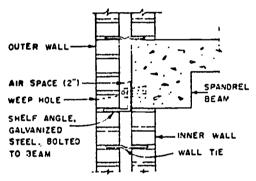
Typical Arrangement of Cavity Wall at a Spandtel Beam.
